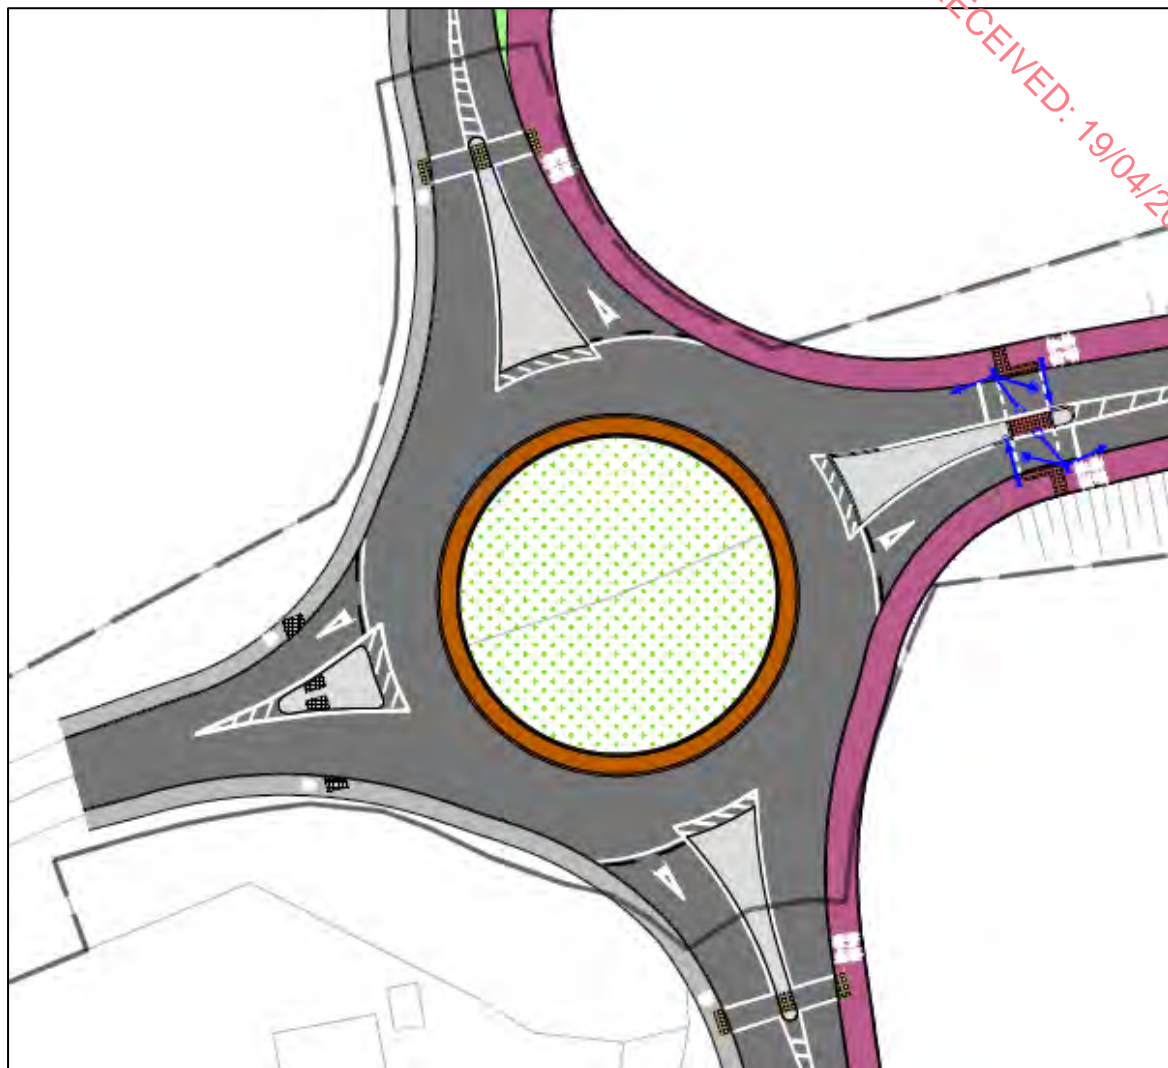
Bhailsigh Road (L1140) Access Roundabout – Proposed Modified Layout.
